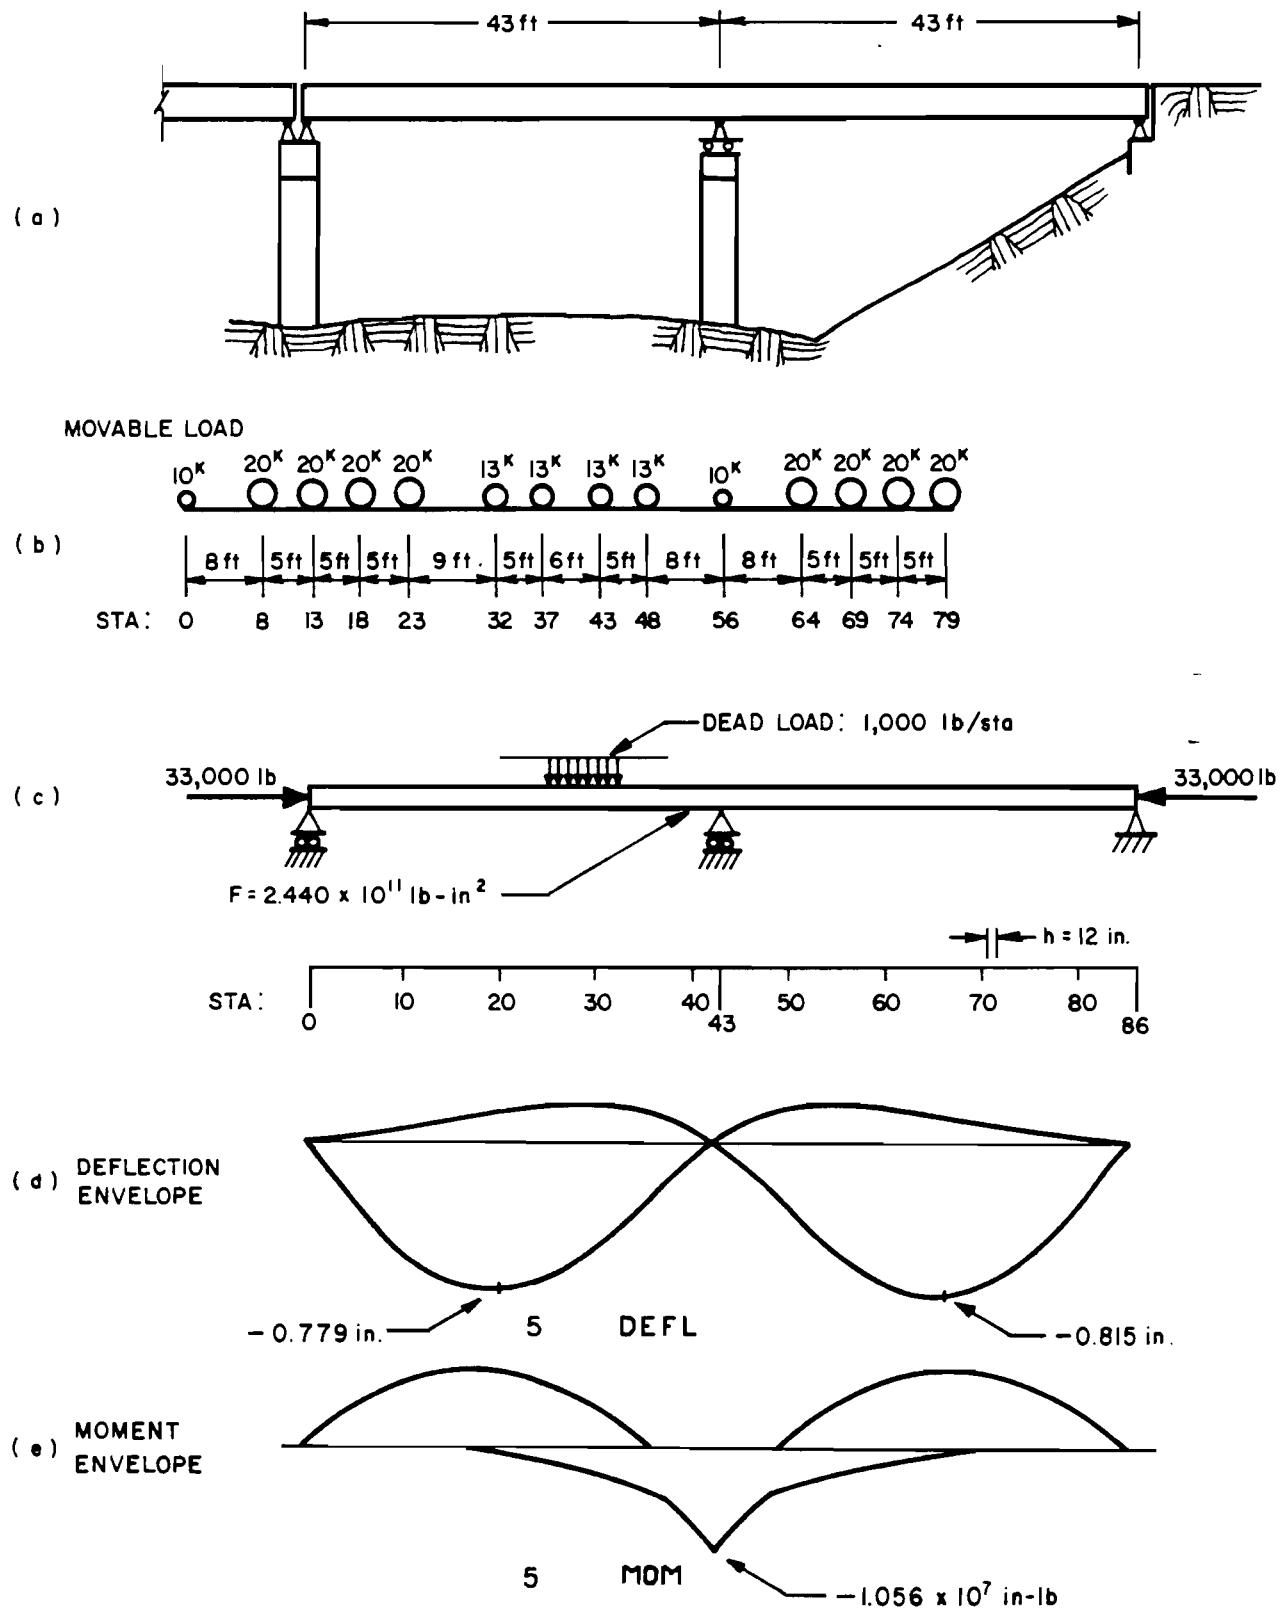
Example Problem 5. Two-span girder structure with railroad loading.
